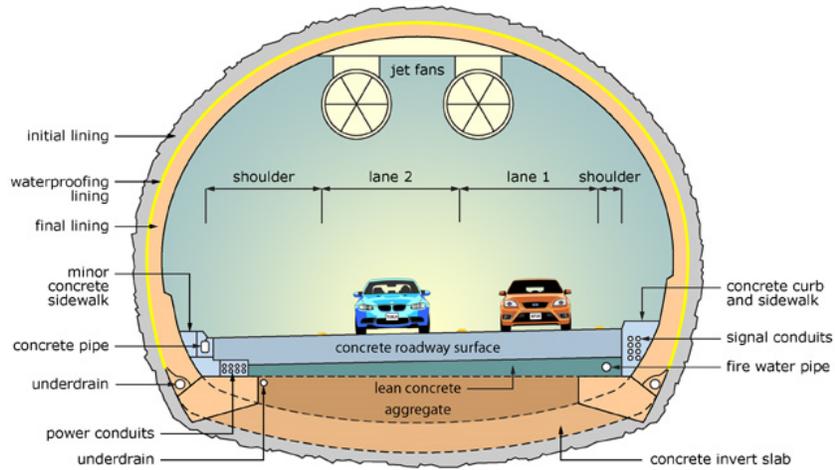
Typical Cross-Section of Non-Circular Highway Tunnel (Reference 1)
